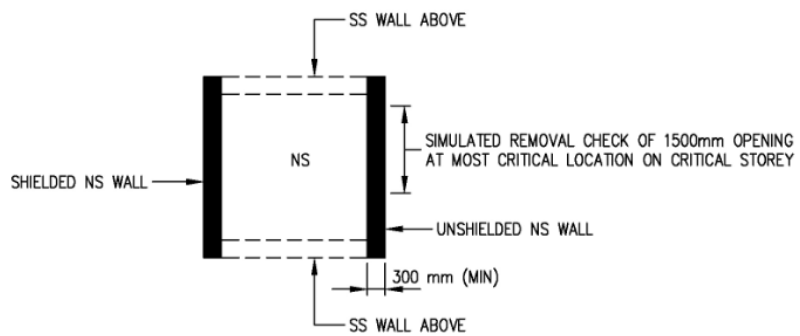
B(ii) : UNSHIELDED NS WALL OF SS TOWER
